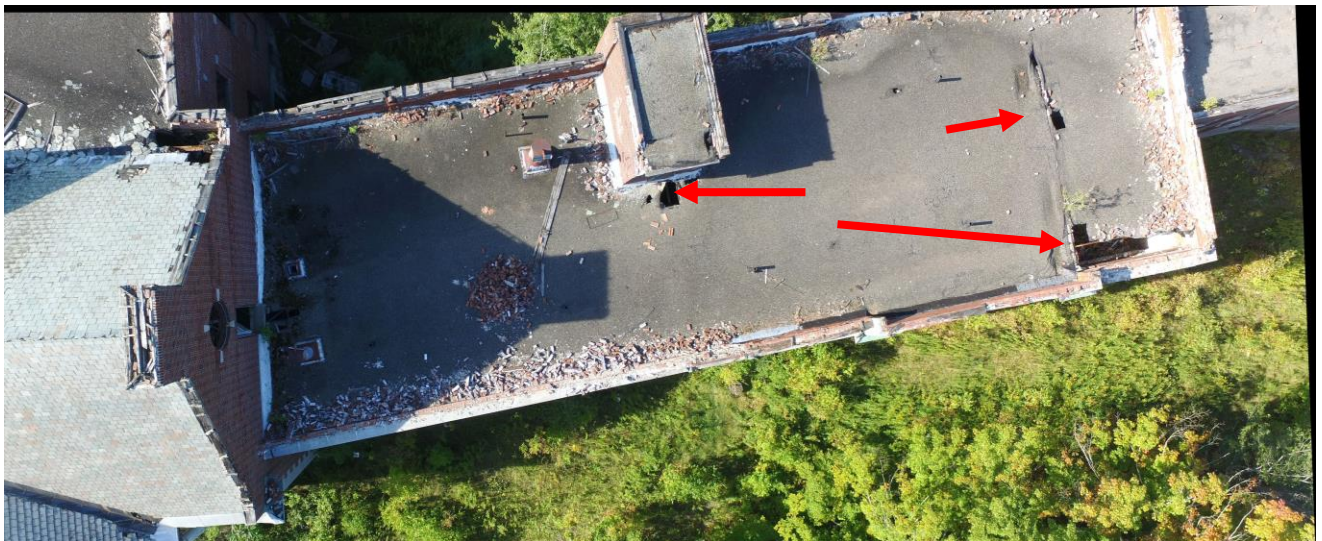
Closer view of roof in Photograph 23. Holes in roof and structural damage can be seen in picture.
